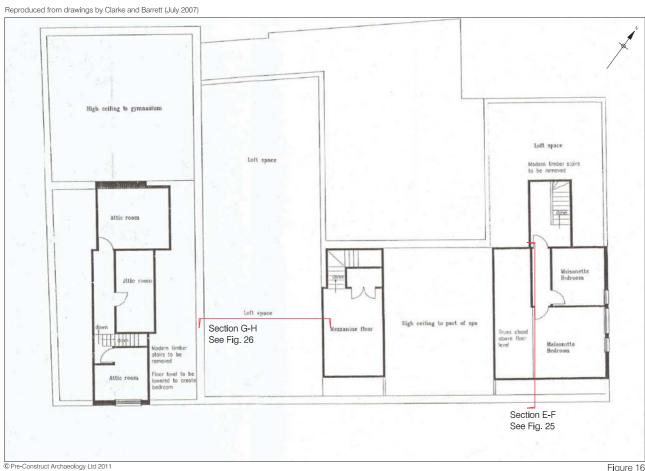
Second floor plan of Maltings (Buildings 5, 6 and 7) Musgrove Maltings, Baldock Not to scale at A4
